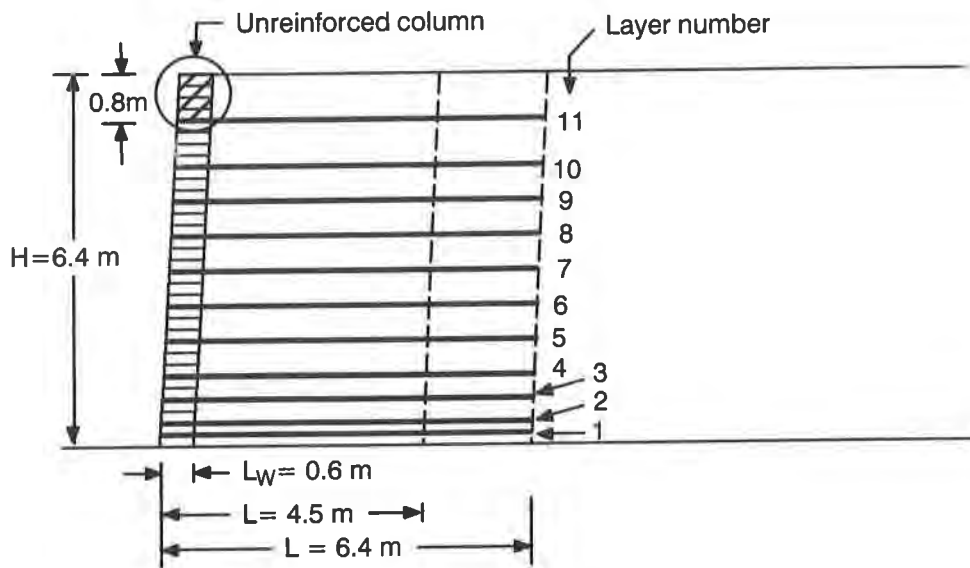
Cross-section of example geosynthetic reinforced segmental wall.
